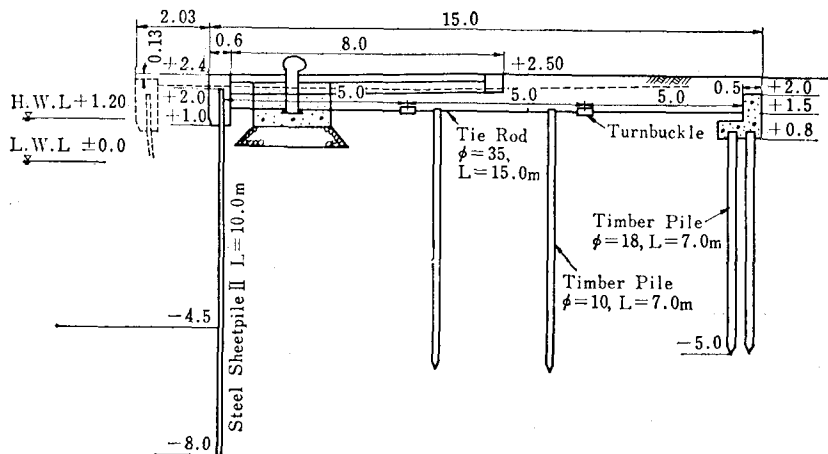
Cross Section of Sheetpile Bulkhead in Hanasaki Port
